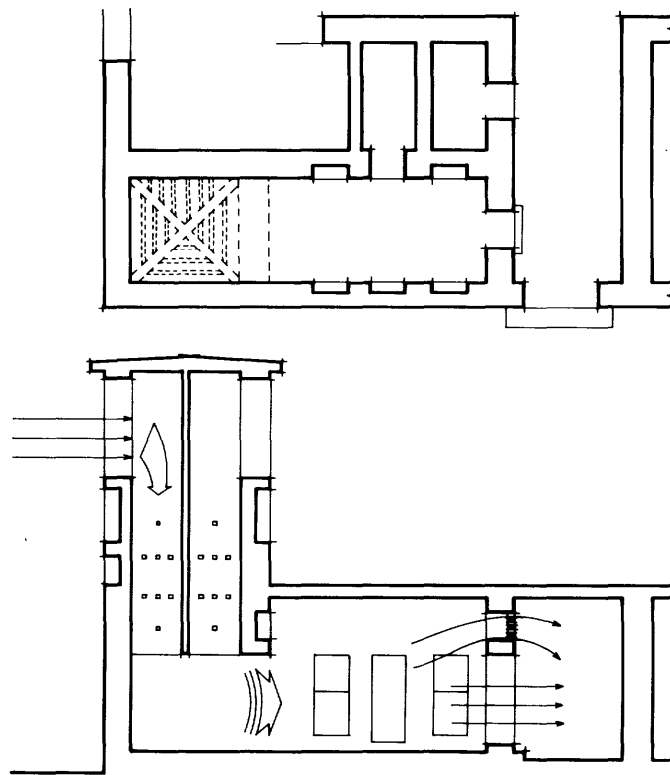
Plan and Section of Badgir. Source: Fathy, (1986)
